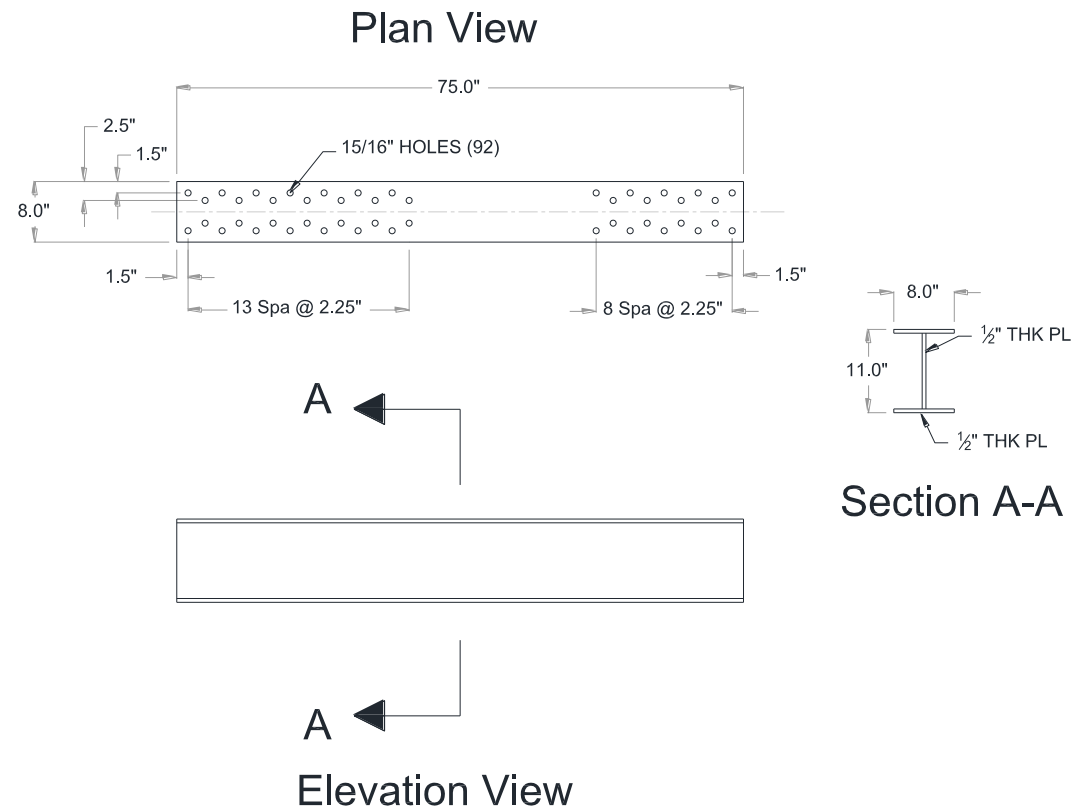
Compression diagonal plan/elevation views and cross-section properties
